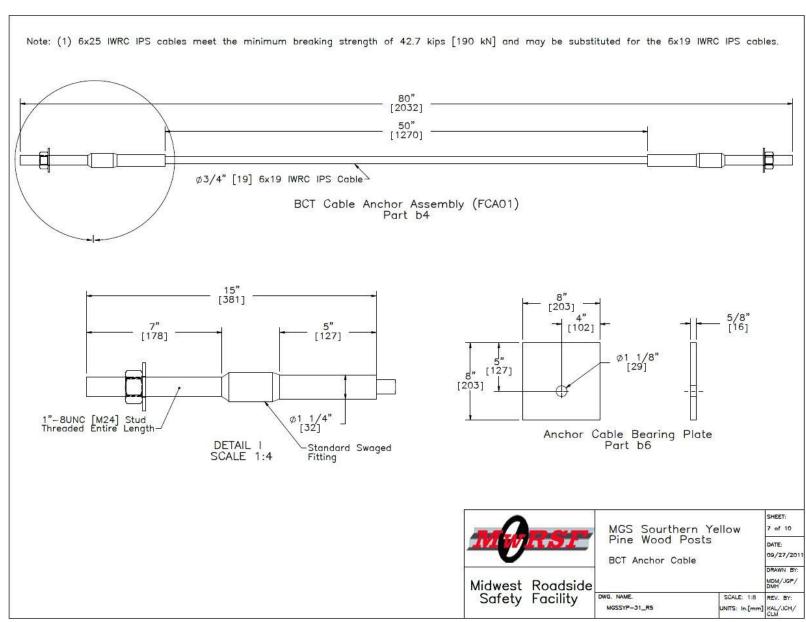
BCT Anchor Cable Details, Test No. MGSSYP-1
